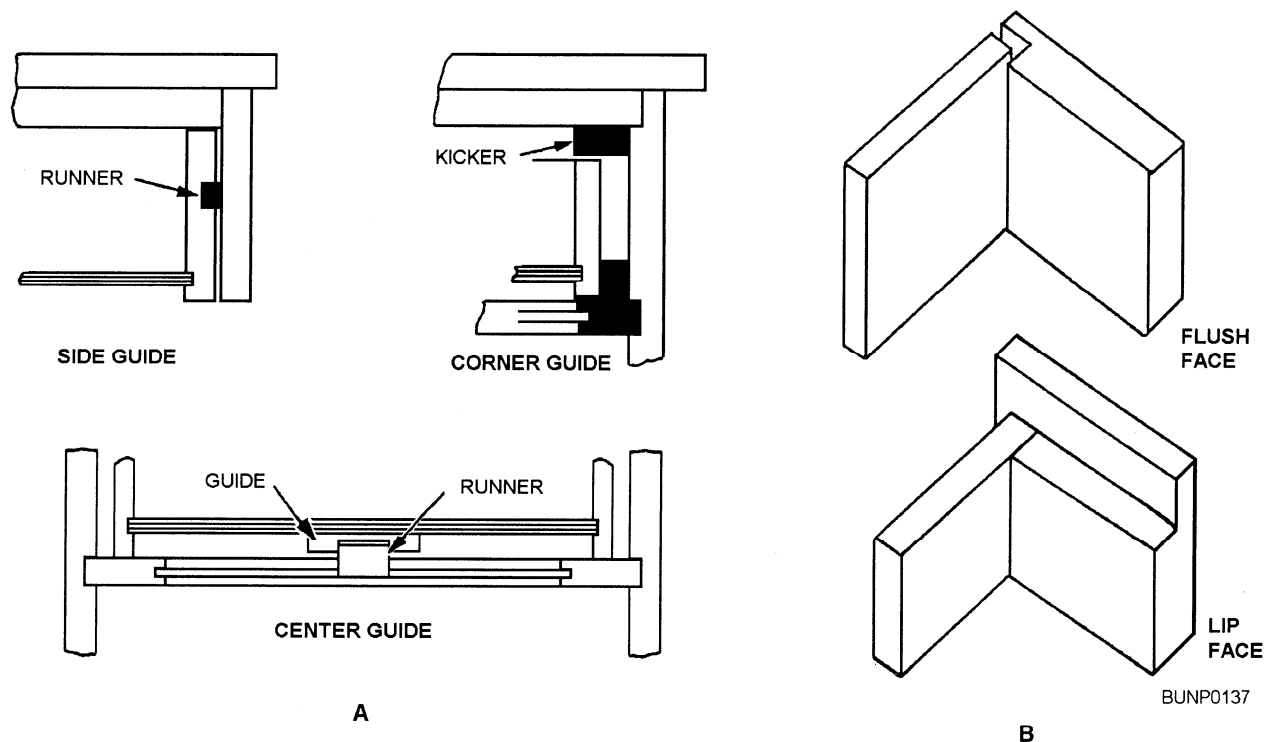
Types of drawer guides (view A) and faces (view B).
